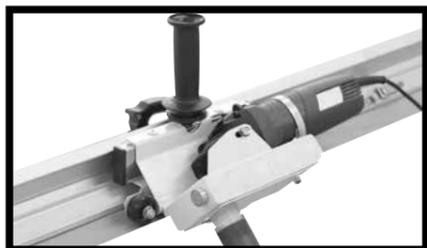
With tile cutter rulers, you can use hand-held angle grinders, fitted into special frames that can be "fit onto" the cutting guide. In this manner, you can provide both 90° and 45° cuts to obtain bevels and jolly pieces.
